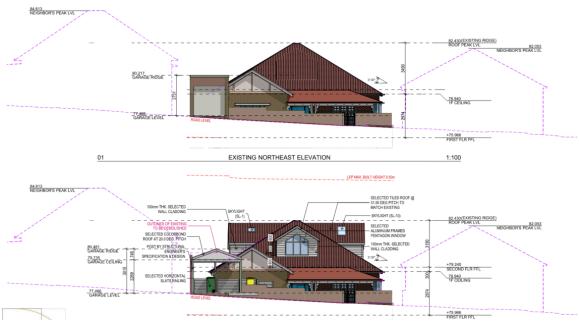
Existing and proposed northeast (street) elevation plans (Source: Perfect Square Design)
